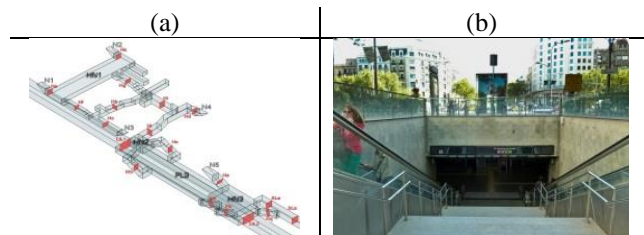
Spatial layout of the PdG underground station (a) and pictures (b).
